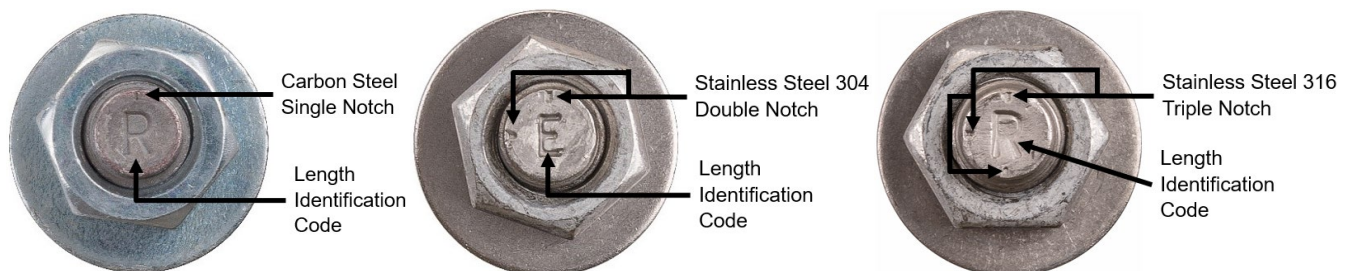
BOLT HEAD WITH LENGTH IDENTIFICATION CODE AND KB-TZ2 HEAD NOTCH EMBOSSEMENT
